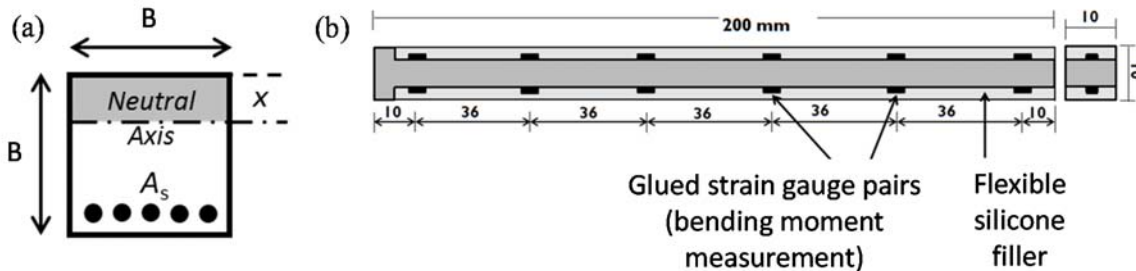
1:50 elastic model of an RC pile: (a) singly-reinforced cracked concrete section (shaded zone in compression); (b) Aluminium-alloy composite section (dimensions in mm at model scale; additional instrumentation also shown).
